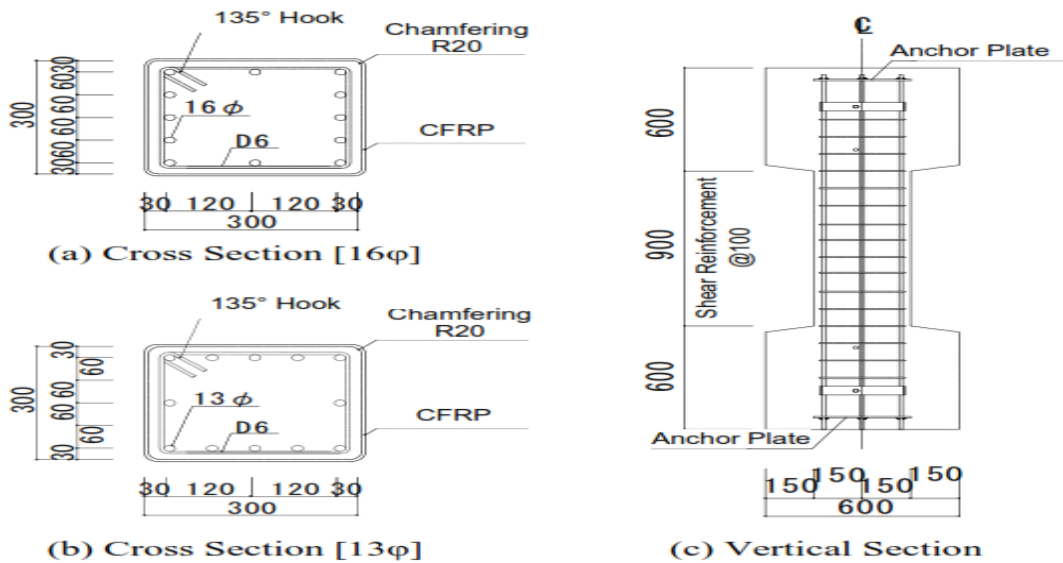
Dimension and Shape of Test Specimens [unit: mm]
